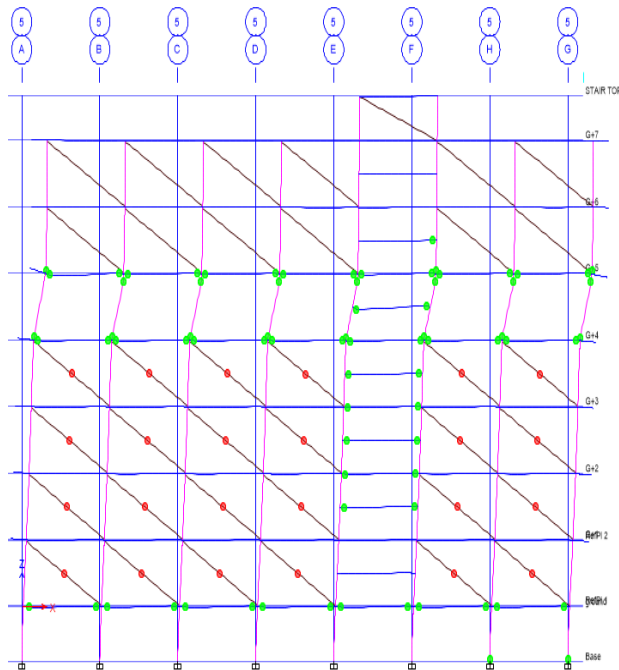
15 Typical failure modes observed for (G+10) plan regular building models
